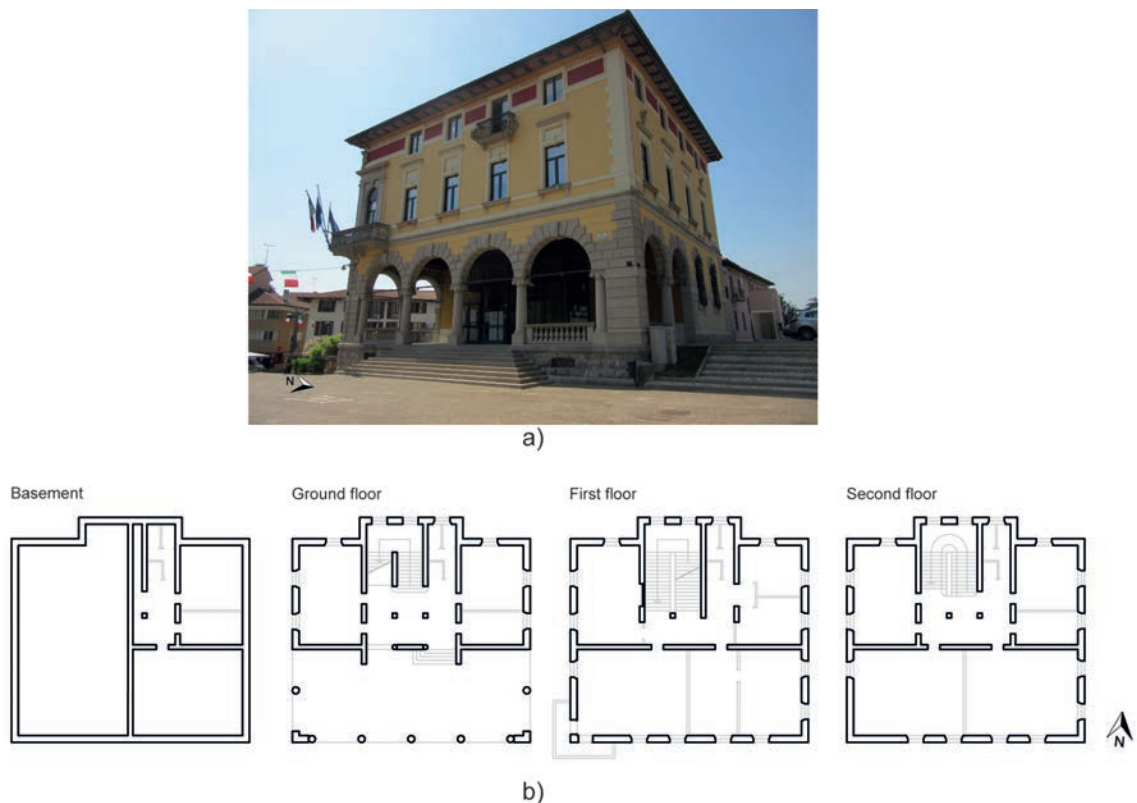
a) photo of the *façade* of Tricesimo town hall; b) plans of the building.
